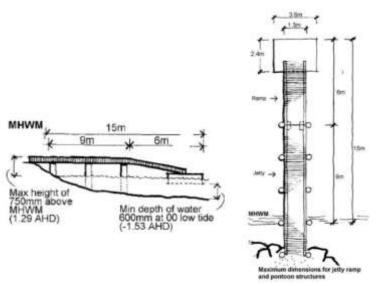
Jetty, ramp and pontoon structures maximum dimensions (GRDCP 2021)
